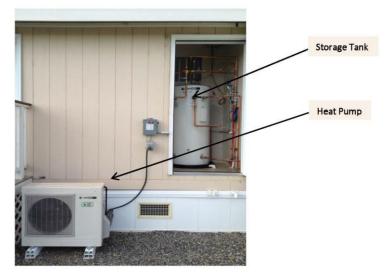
Sanden Split-System Heat Pump Water Heater as Installed in PNNL Lab Homes
